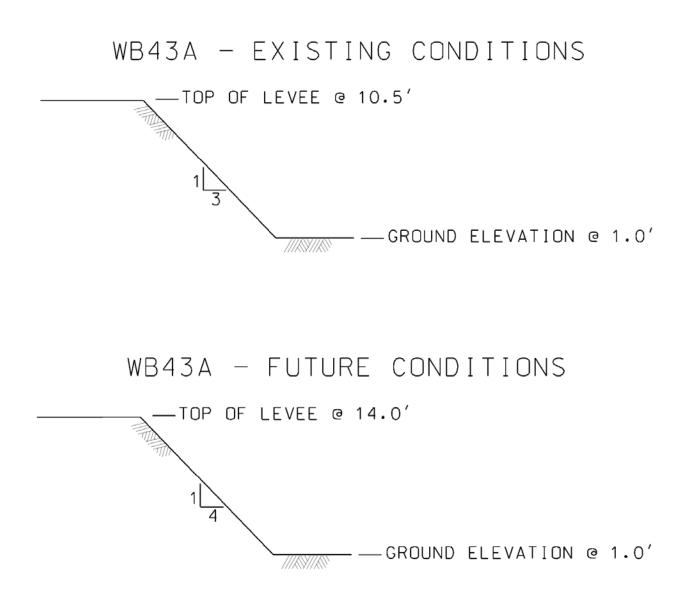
Typical Levee Design Cross-sections Westwego to Harvey Levees WB43-A
